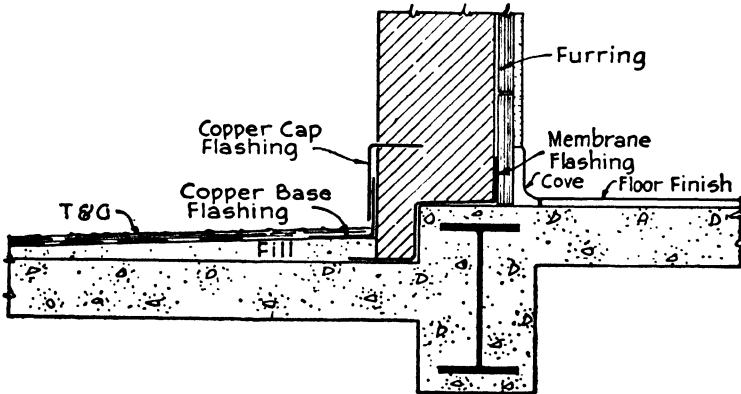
Flashing at Intersection of Roof and Wall.
